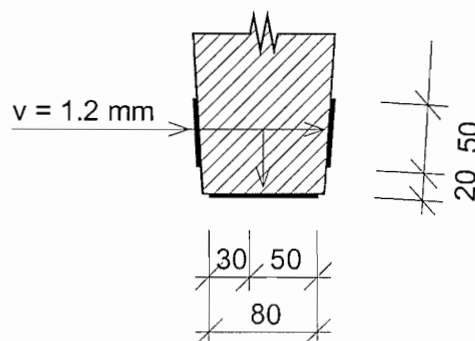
Arrangement of the CFRP plates for beam no.4
